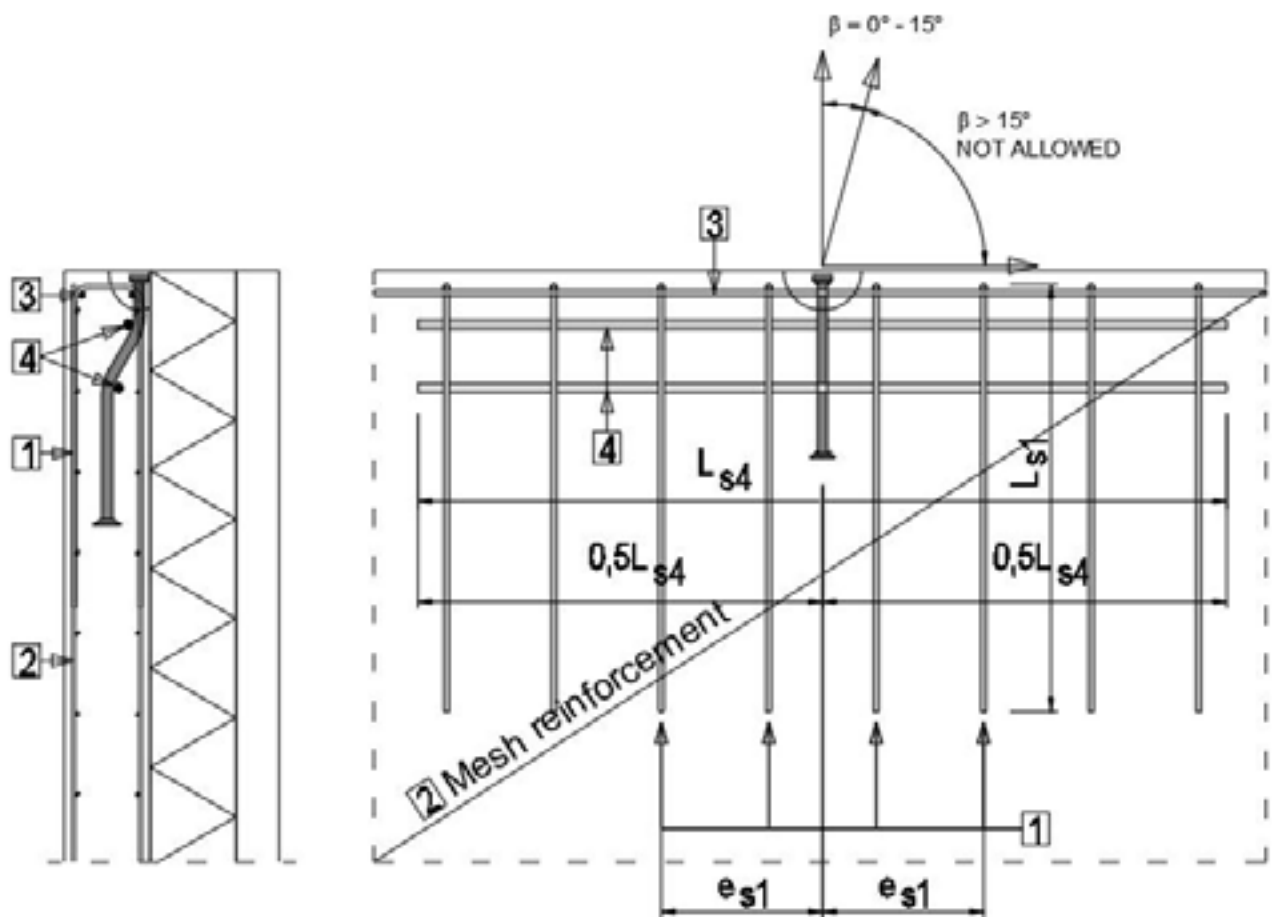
RLAB lifting insert reinforcement for axial pull in wall elements
